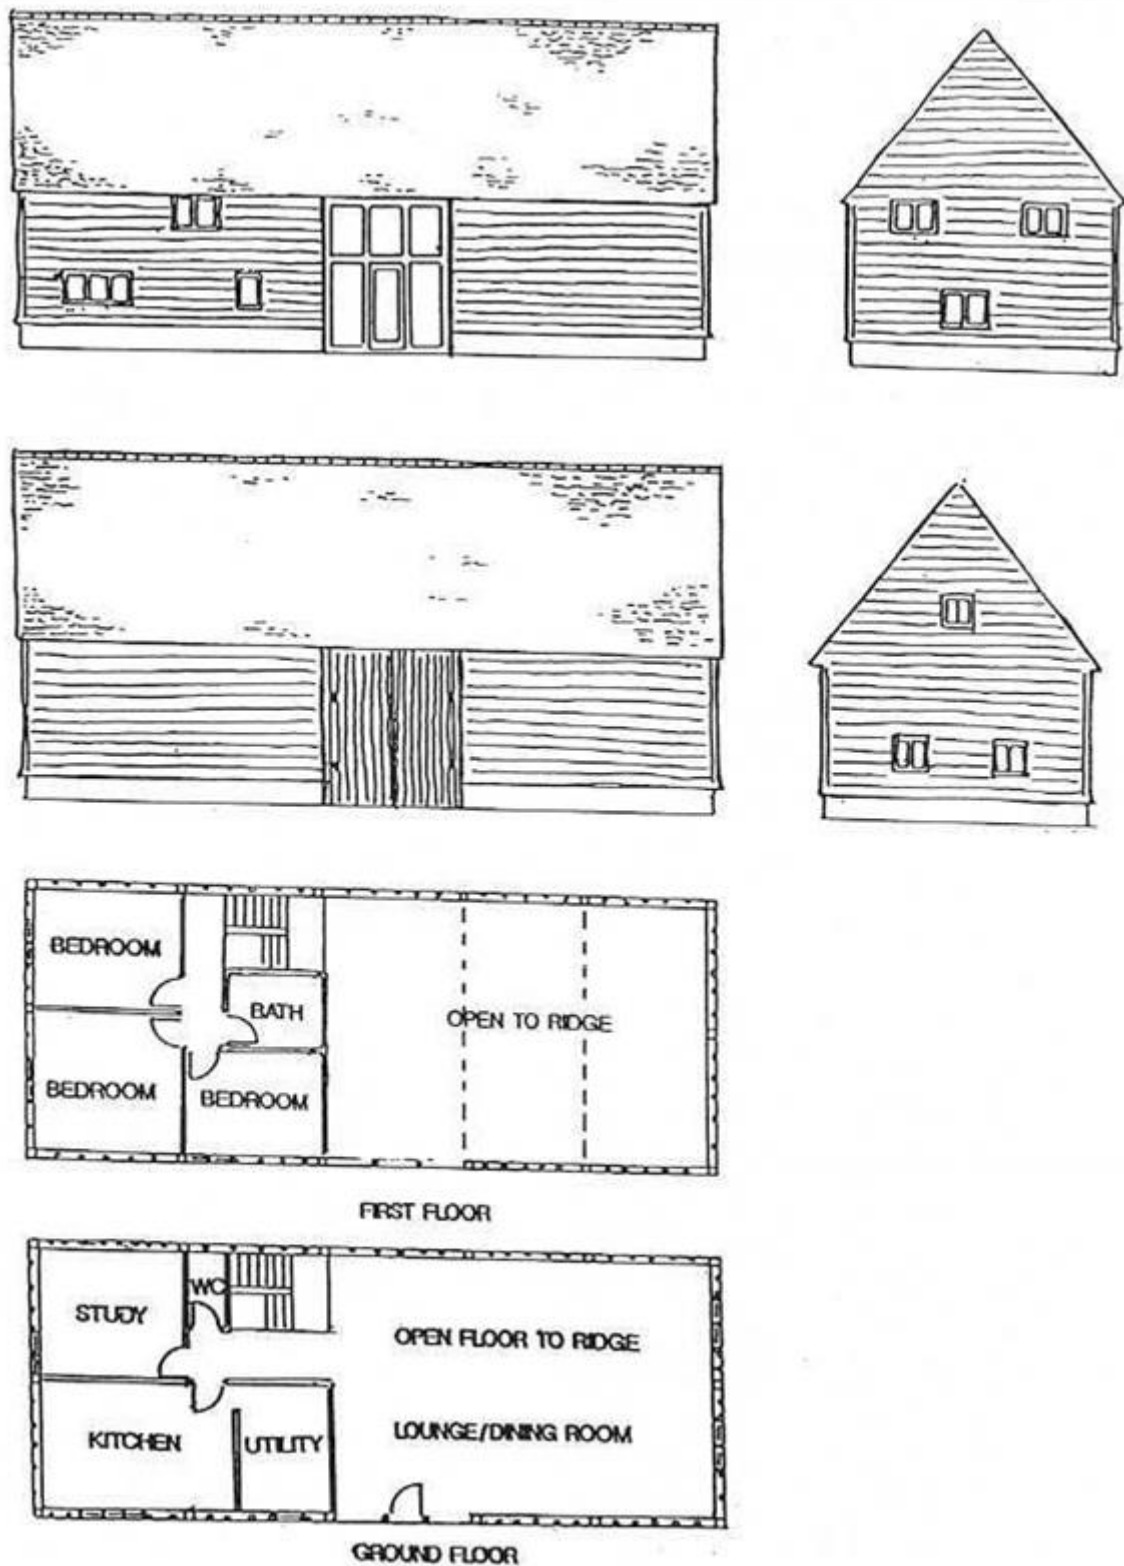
5 bay barn conversion keeping 3 bays open. Note public side unaltered.
